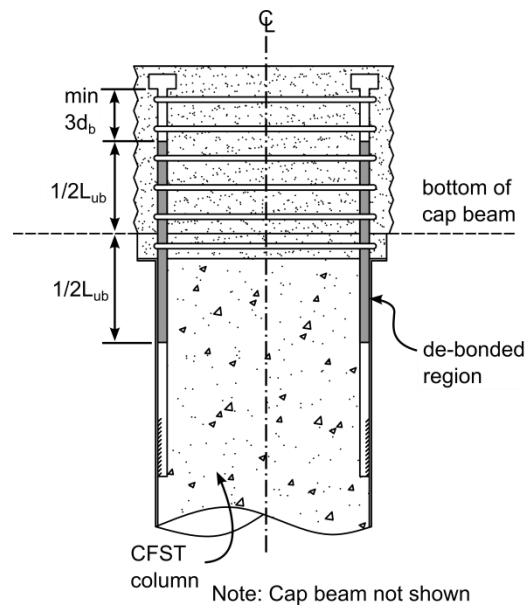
Welded Dowel Connection De-bonding Dimensions
